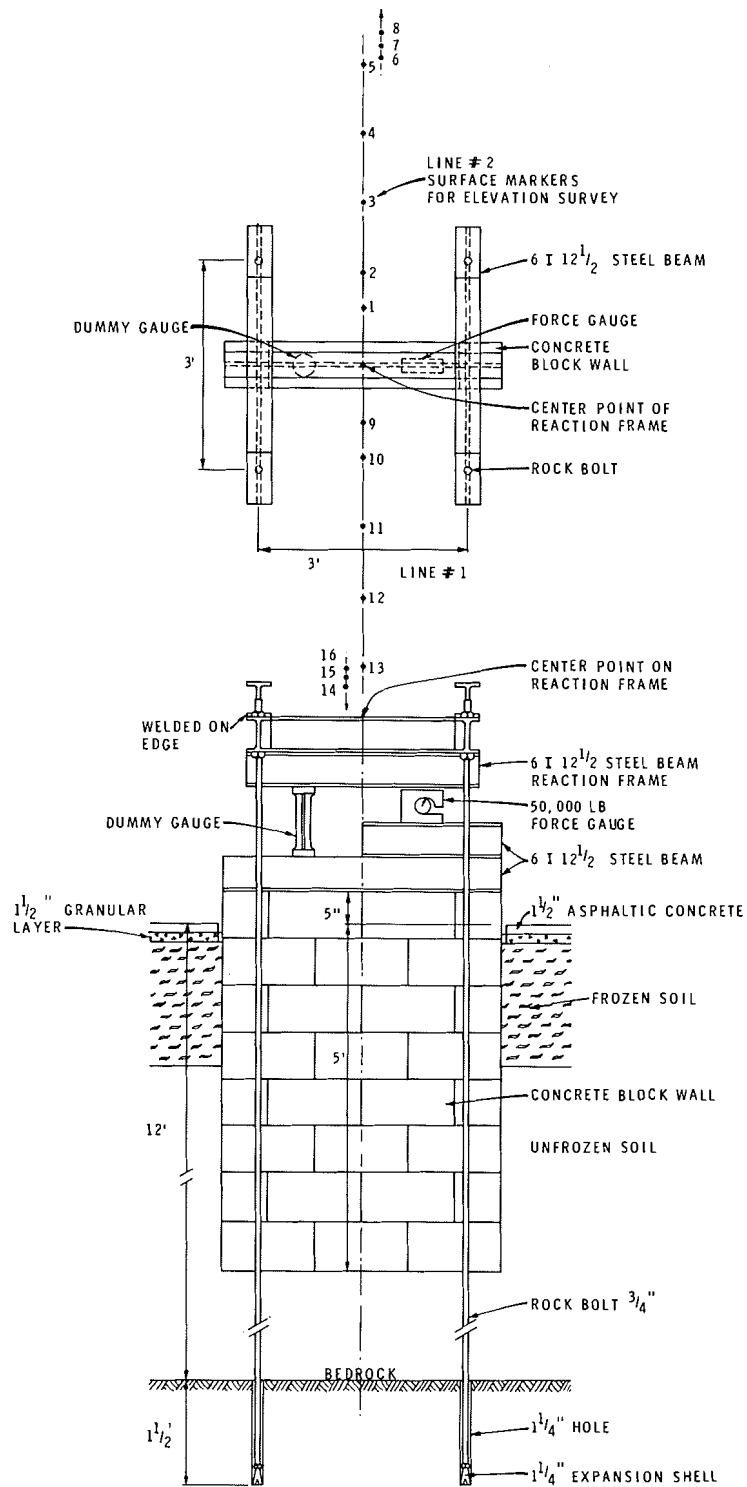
Installation to measure heaving forces by adfreezing on concrete block wall.
